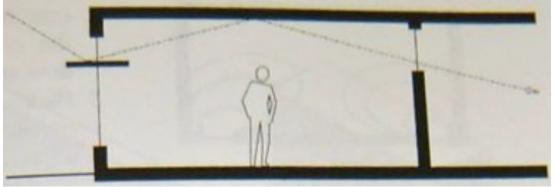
Shading system of the Figure 11: Shading system of the south facing facade of the Southface office building in Atlanta, GA, USA
